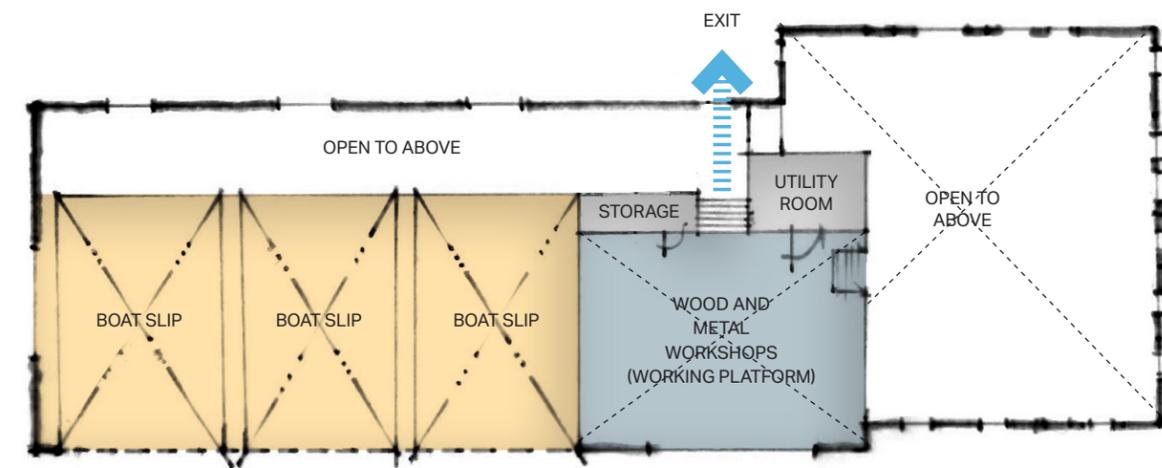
EXISTING BOATHOUSE (SEAMANSHIP BUILDING) - FIRST FLOOR
